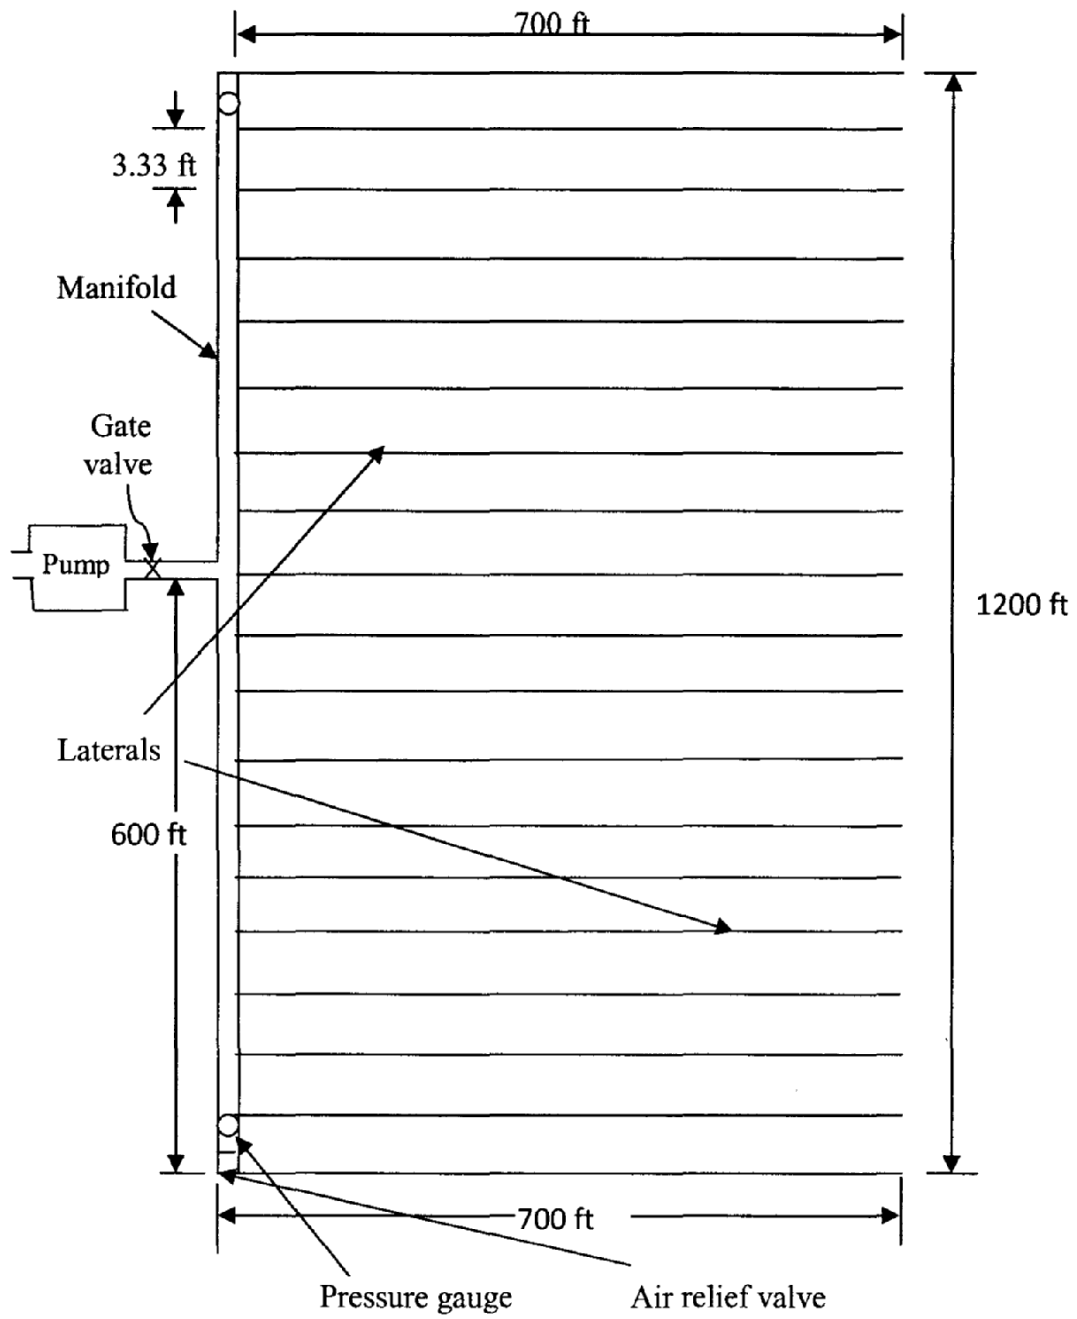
Design of the low pressure drip irrigation system with one manifold
